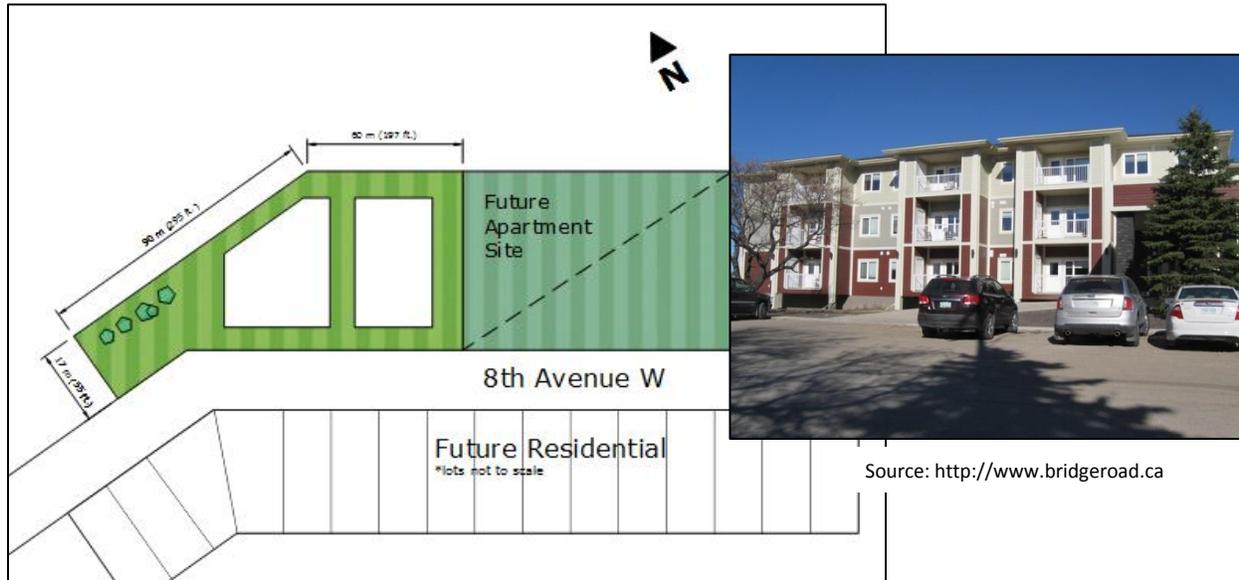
above illustrates a conceptual site layout that would be a continuation of the BridgeRoad development to the east of the lot (identified as “Future Apartment Site”). Also with the concept site layout is an example image of another Bridge Road development in a Saskatchewan community.
